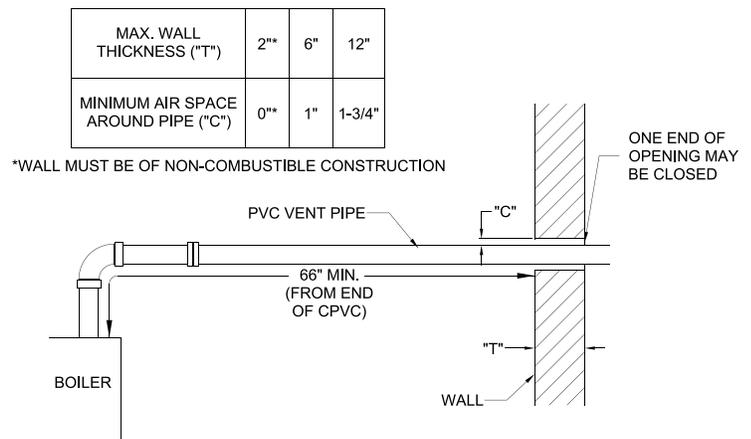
Wall Penetration Clearances for PVC Vent Pipe
